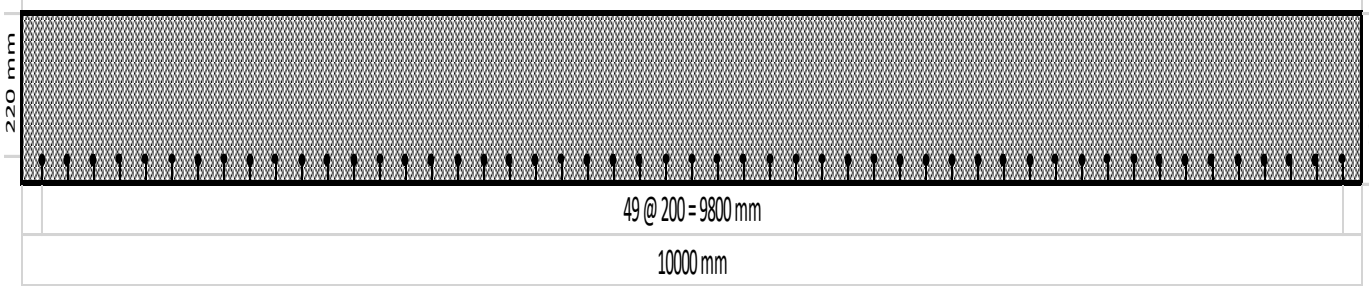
Main bar arrangement of 200-mm on-centers spacing for the entire 10-m span bridge
